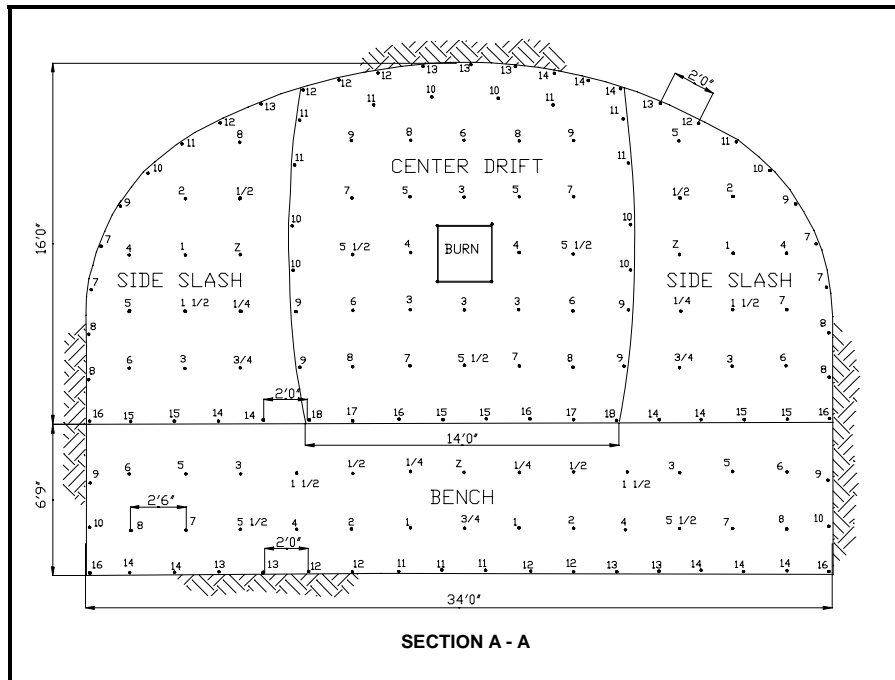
Typical Drill Hole Pattern for Drill and Blast Rock Excavation of Similar Size and Shape to DGR Emplacement Rooms
